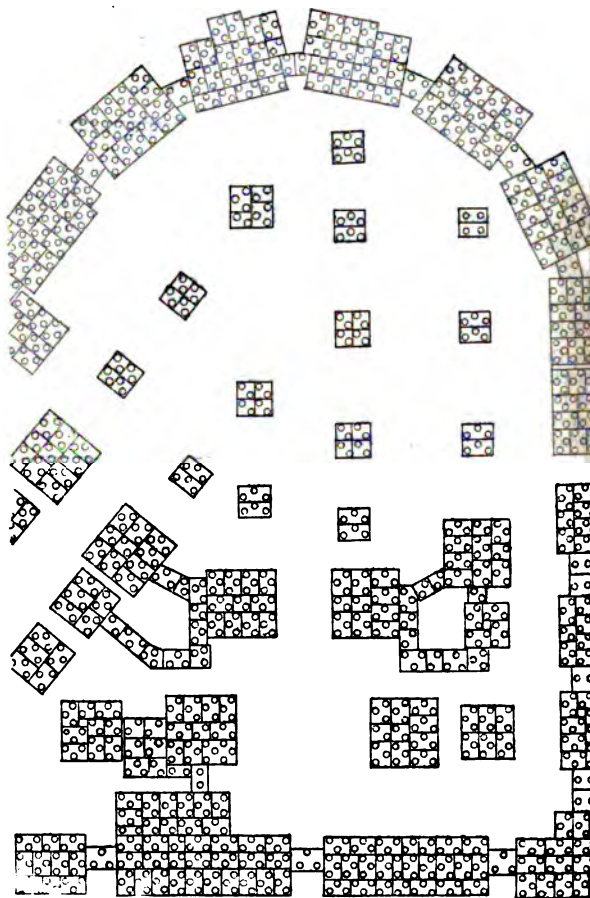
Piling-plan, Chamber of Commerce Building, Boston, Mass.
